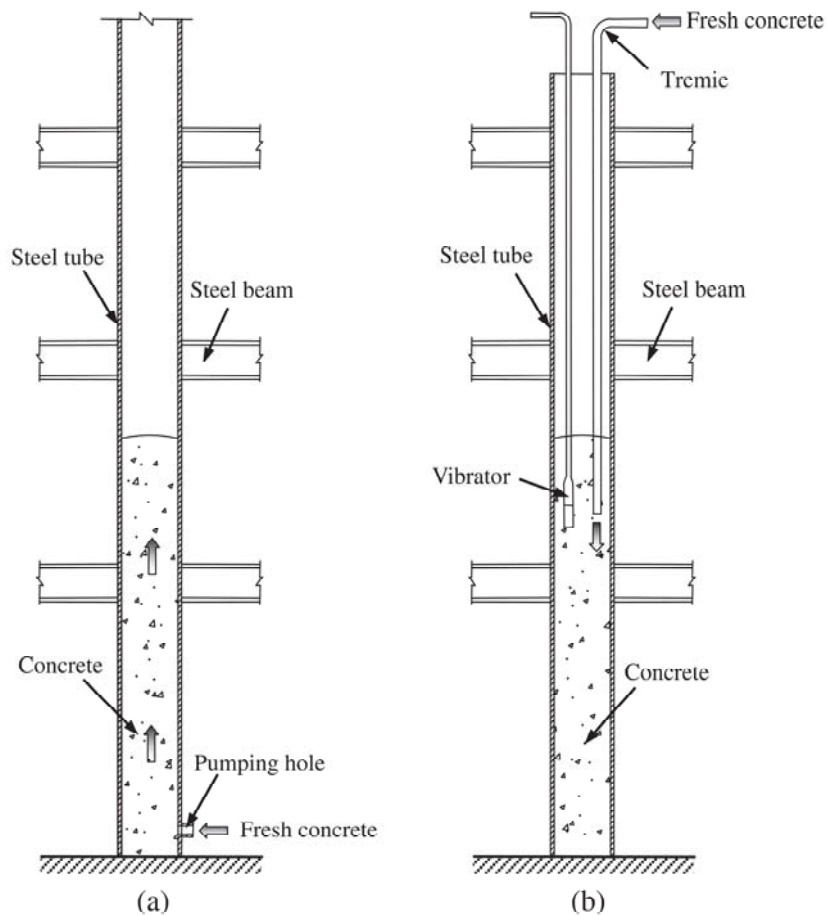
Schematic view of concrete placement systems (Han et al. 2014):
